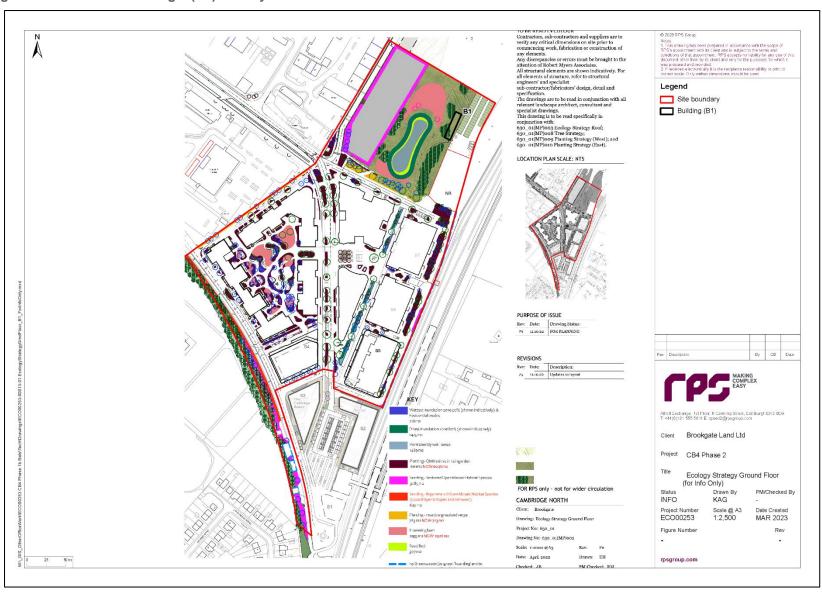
Location of building 1 (B1) overlayed onto the Master Plan
